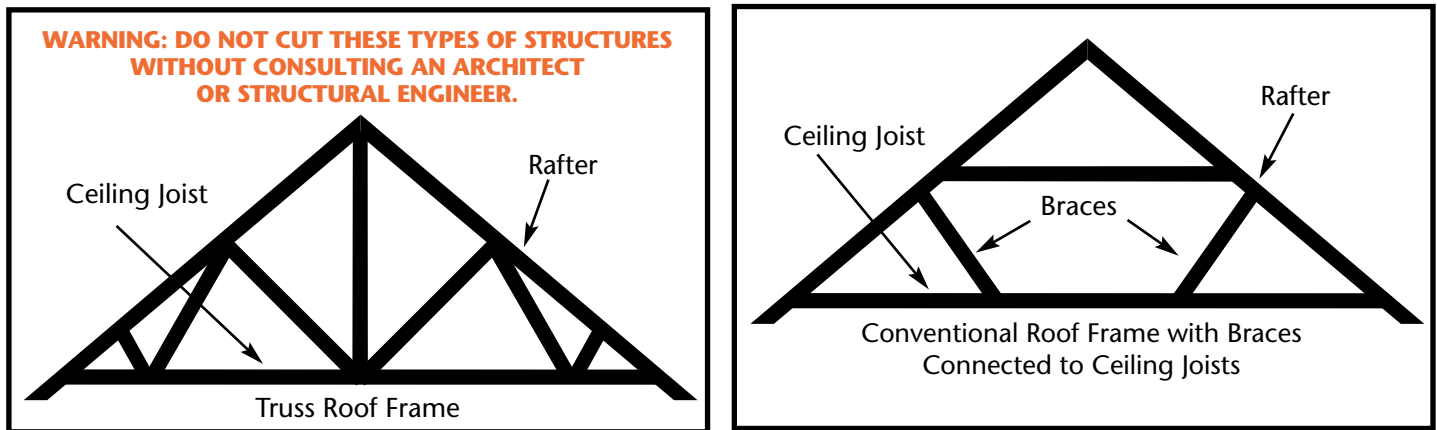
Truss roof frame and conventional roof frame with braces connected to ceiling joists.
